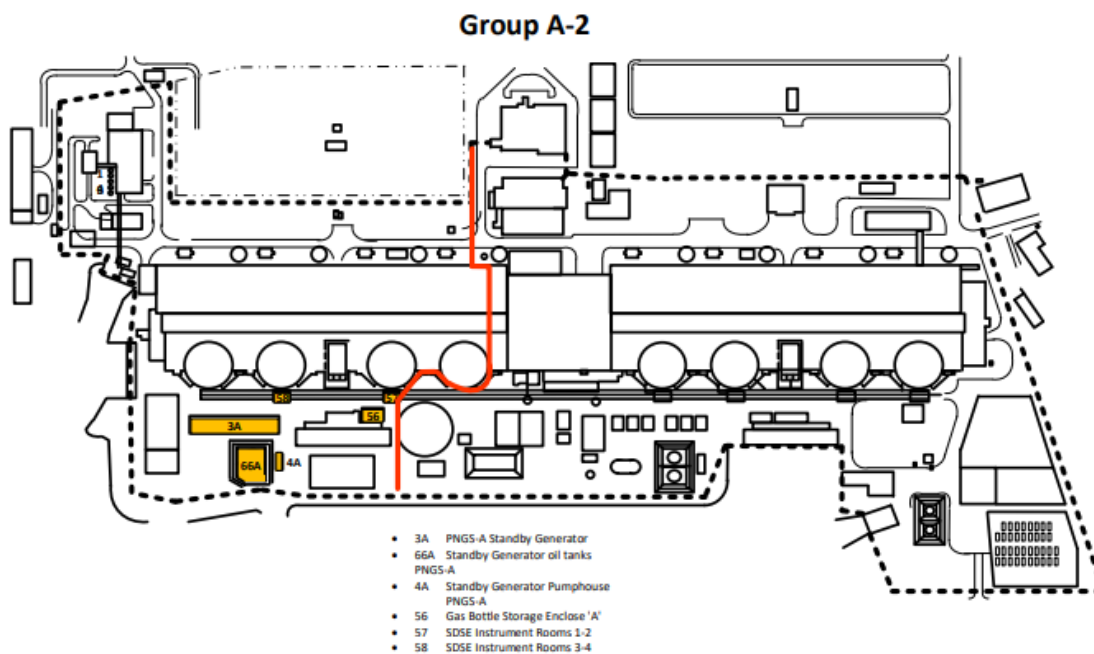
Planning Envelope A-2 – Outbuildings in Orange
